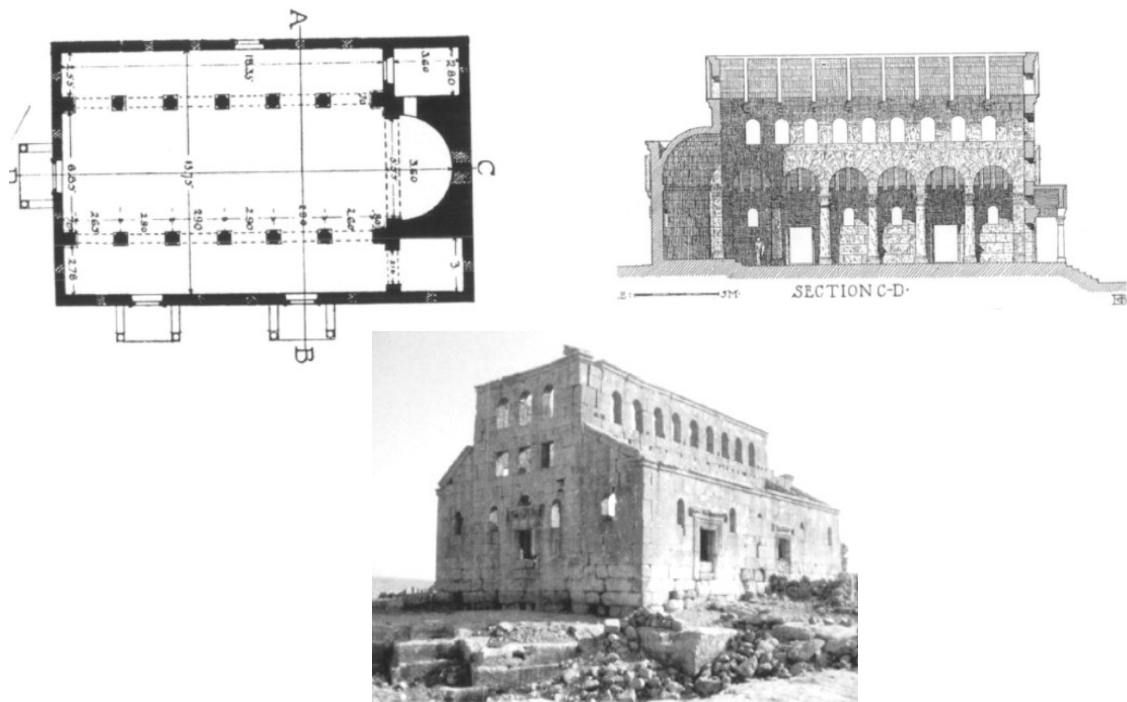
Mashabbak Church plan, section, and exterior view from south-west, (*Kennedy, 2016, p. 9*).
